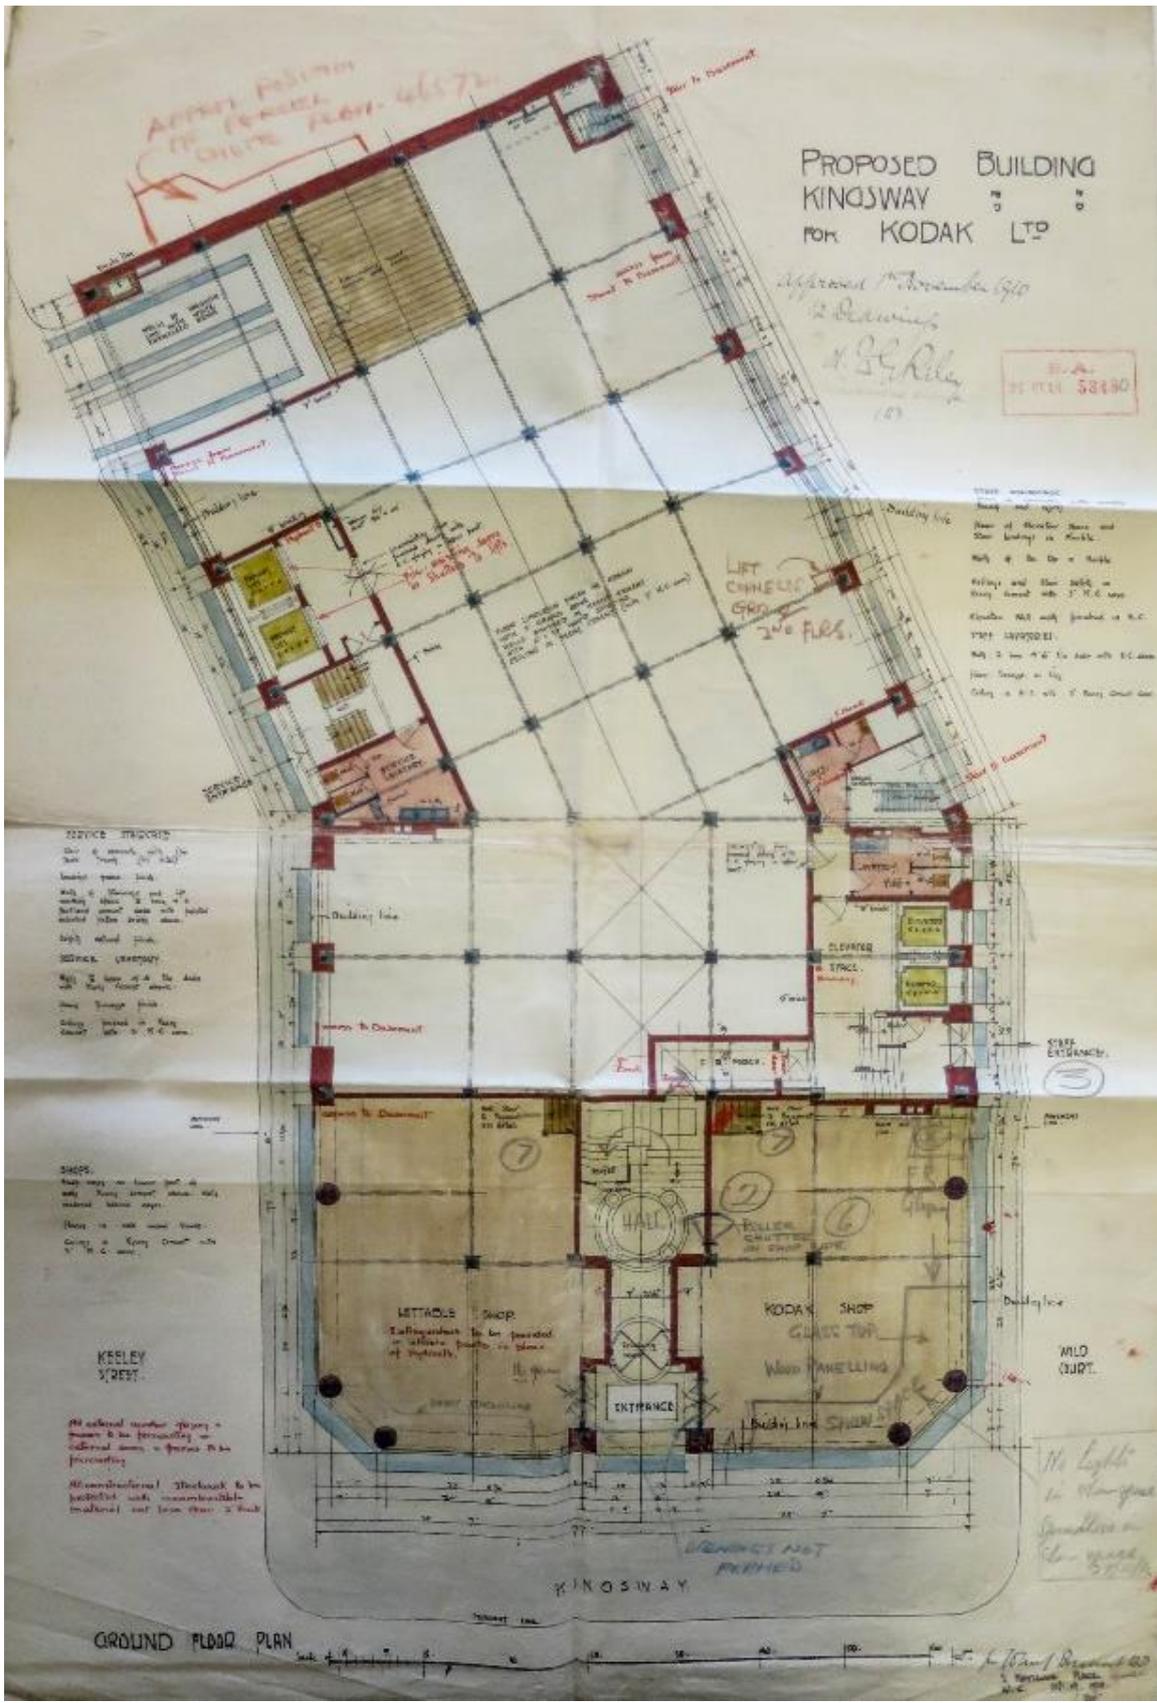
Extract from the 1910 application showing the proposed ground floor plan. Note enclosure to the right of steps leading up from the entrance hall.
